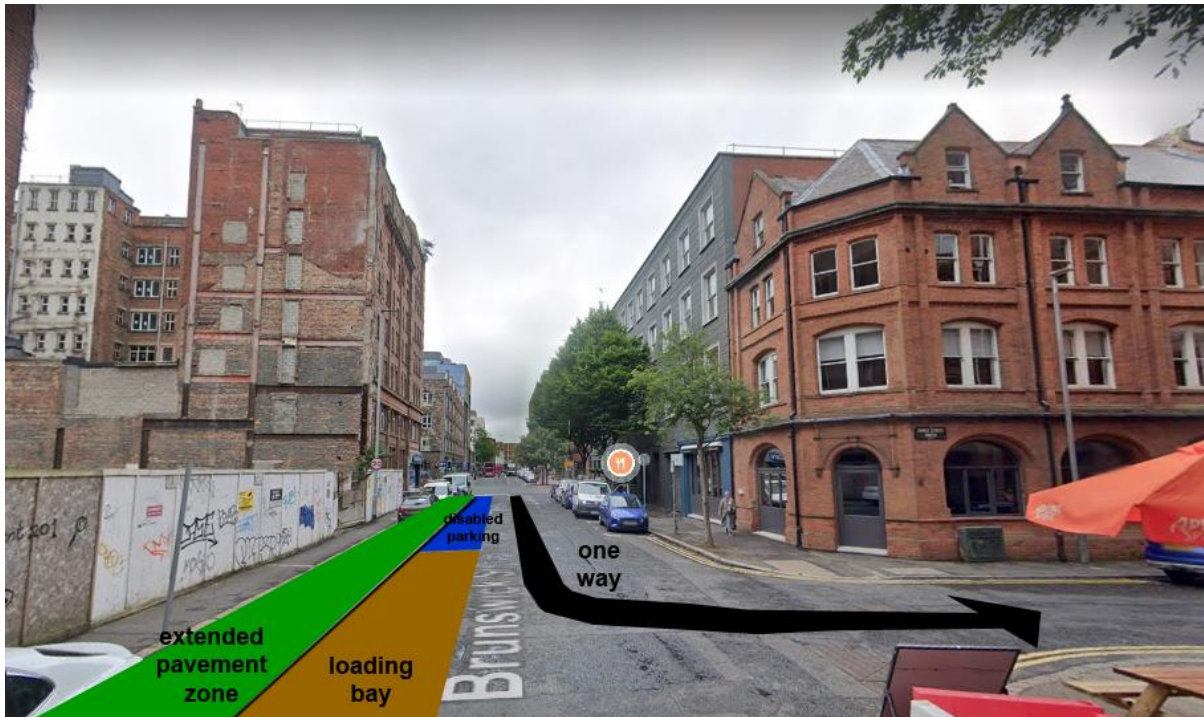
impression of proposed interventions on Brunswick Street (view looking North)
